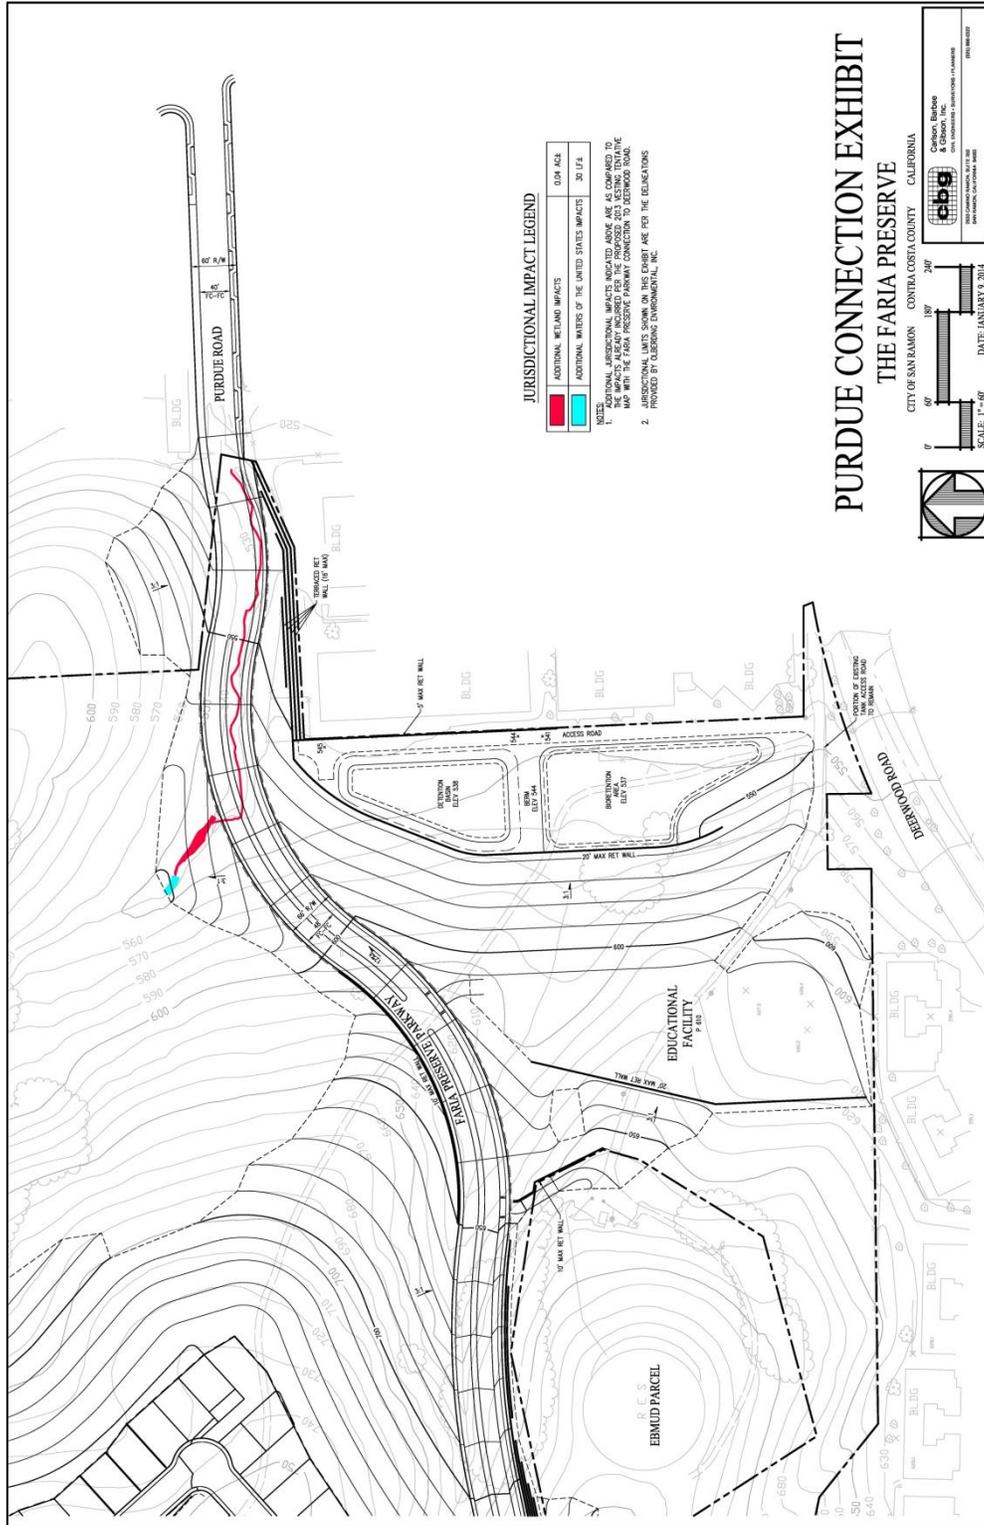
Impacts to Jurisdictional Waters with New Purdue Road Site Access
